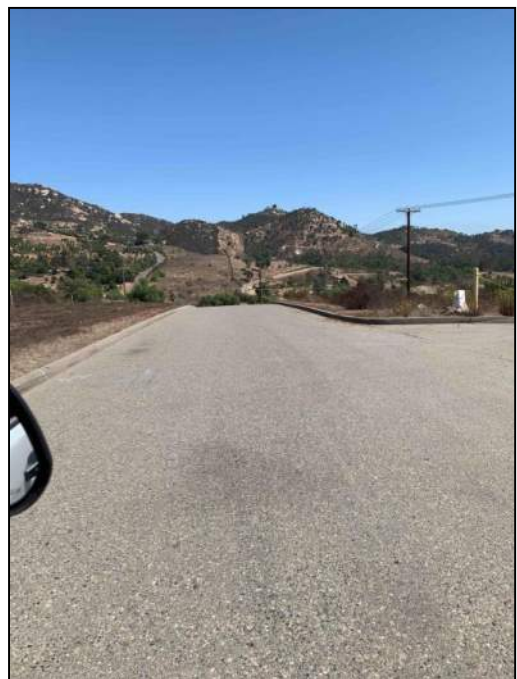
View looking east from TOVWTP of west portal location on hillside.
